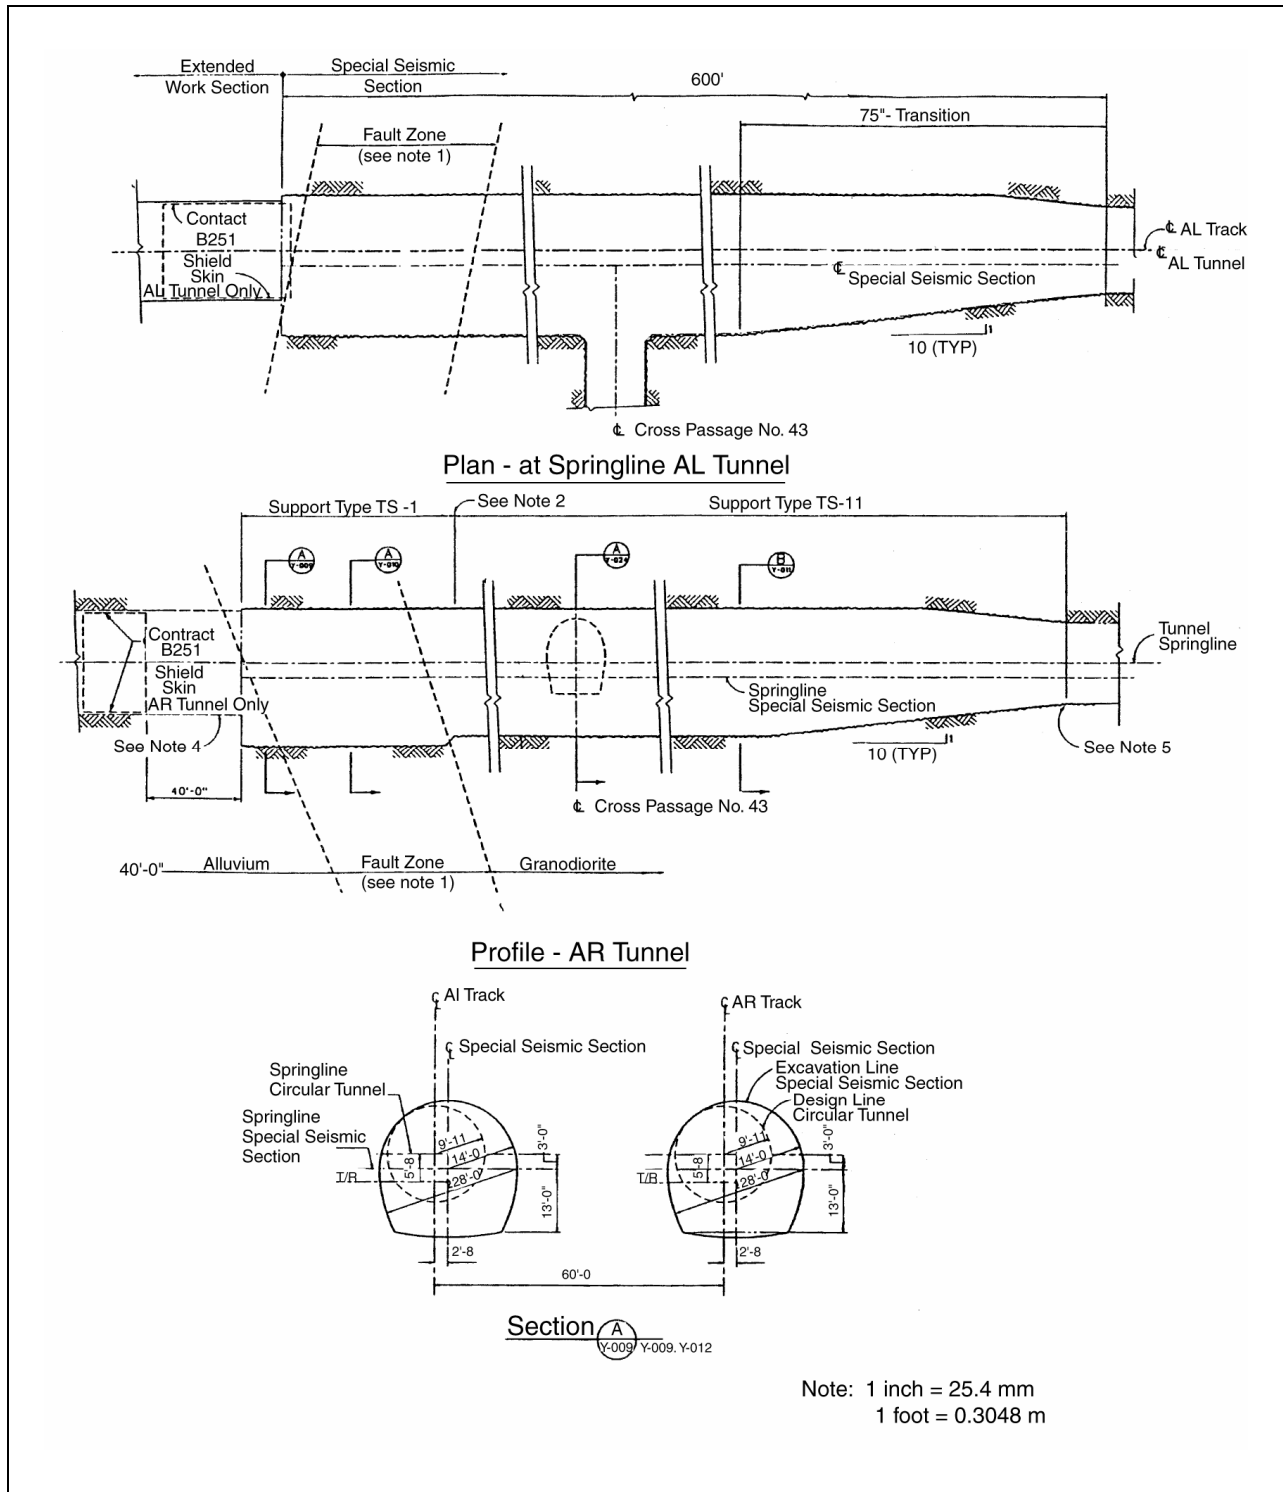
Enlarged tunnel at fault crossing, plan view, strike-slip faulting.
